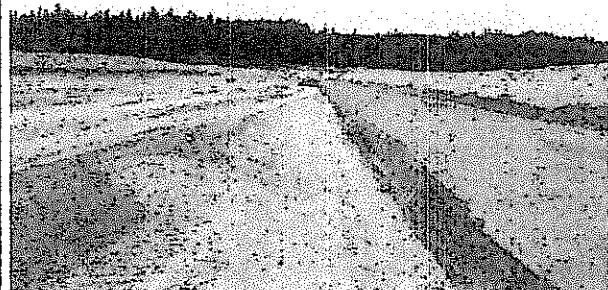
Looking northwest along South embankment, excavator trimming till core to design lines.
